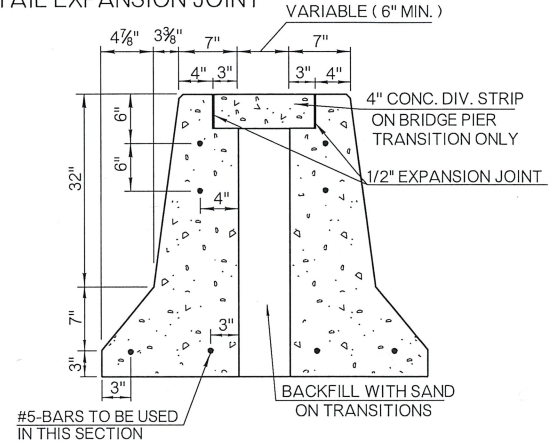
DETAIL OF TRANSITION SECTION AT BRIDGE PIERS
